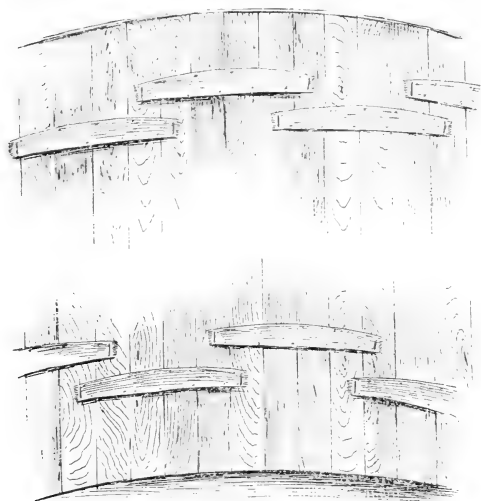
Shows how barrel staves may be used in setting up a silo, they should be removed before the silo is filled.
